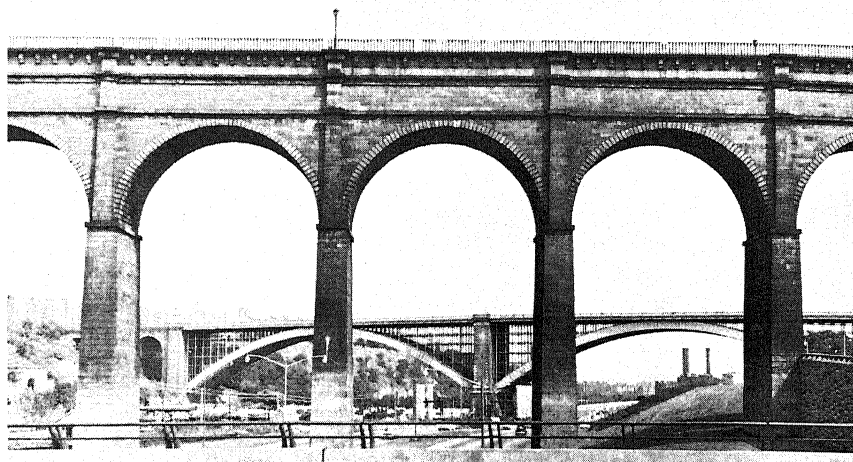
John B. Jervis, engineer. Aqueduct (High) Bridge over the Harlem, New York City, 1839–1842. Washington Bridge appears in the background.
